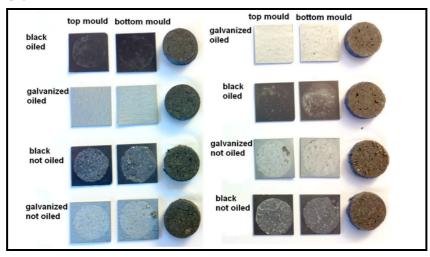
Example of oiled and unoiled steel moulds black and galvanized surface. Left and right different template
